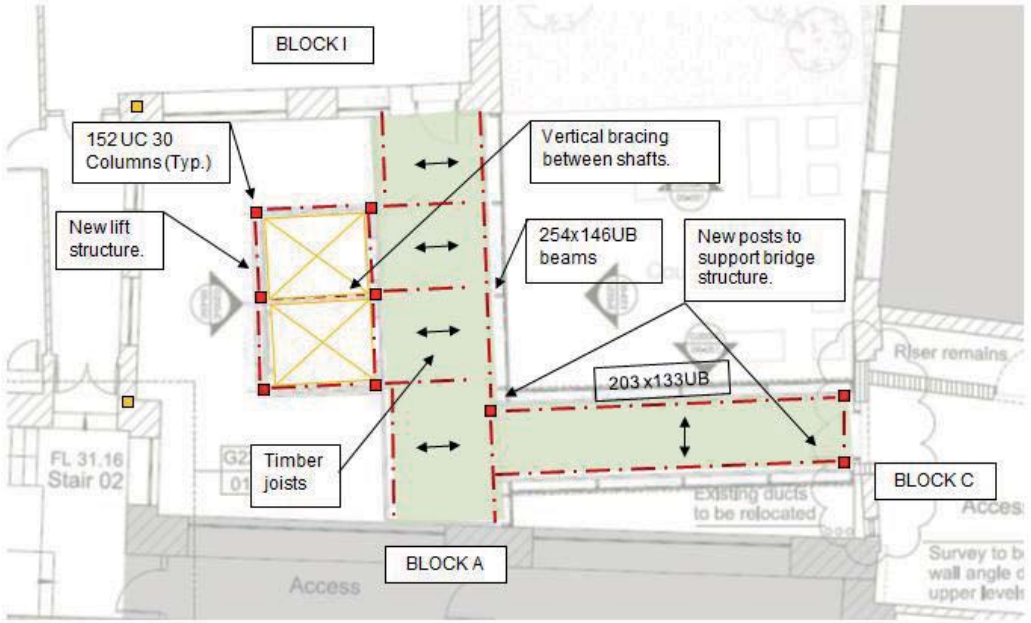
Extract of Sketch SK 011. Rear courtyard – First Floor. Refer to sketches in Appendix A for other floors
